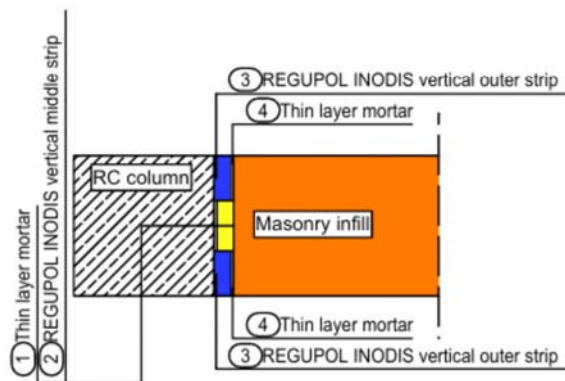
Brick infill walls with recycled rubber strip connection
